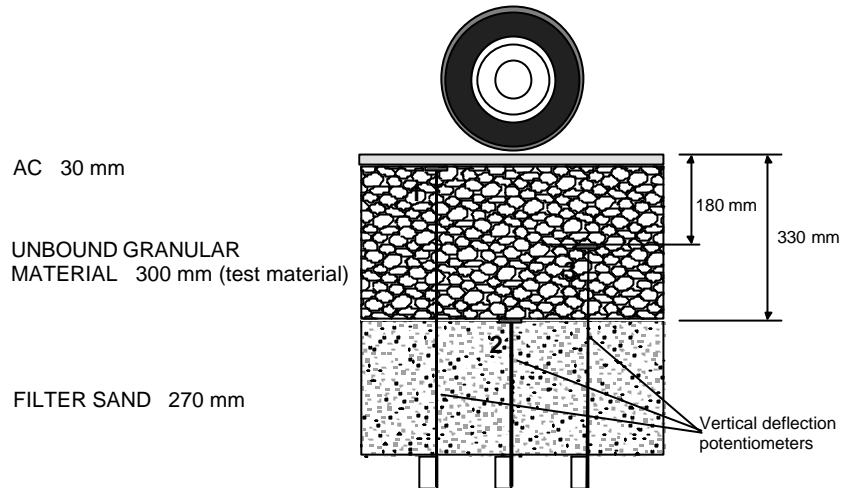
TEST PAVEMENT STRUCTURE
